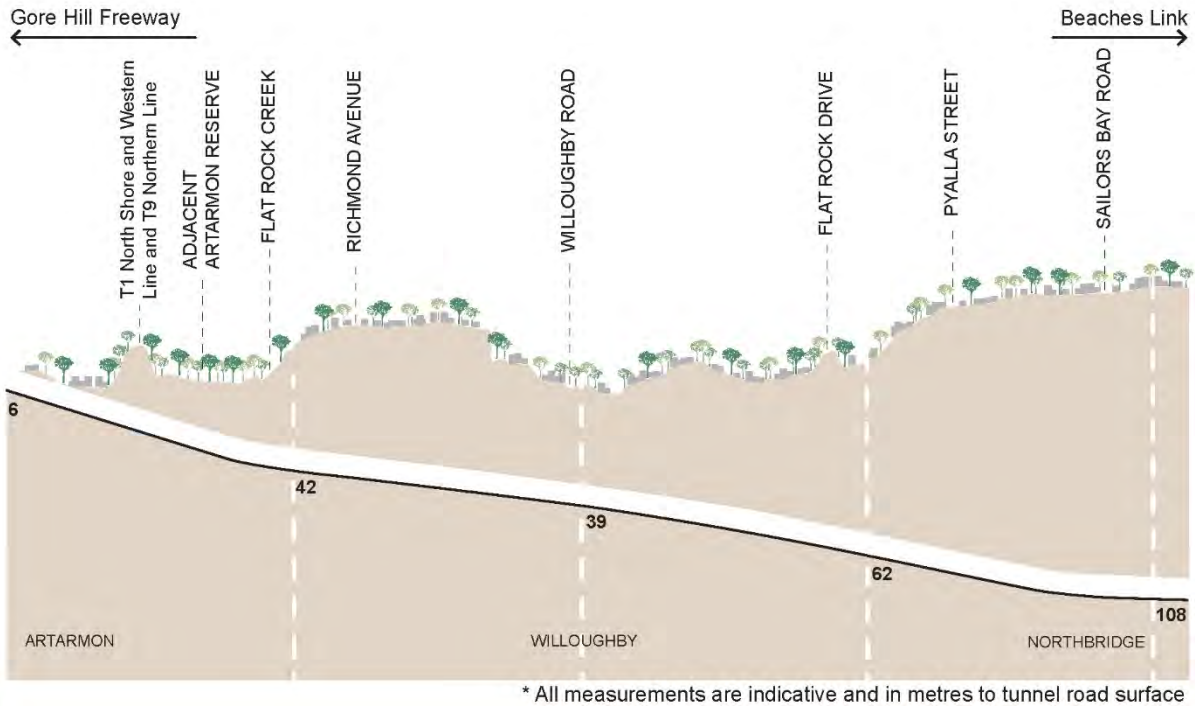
Indicative vertical alignment of the ramp tunnel connection to the Gore Hill Freeway
